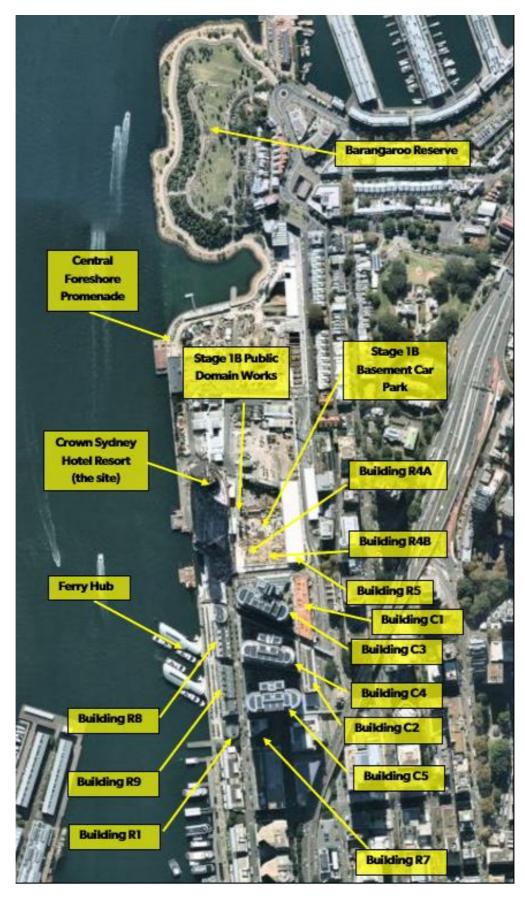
| Barangaroo construction and completed projects plan (Base source: Nearmap)
